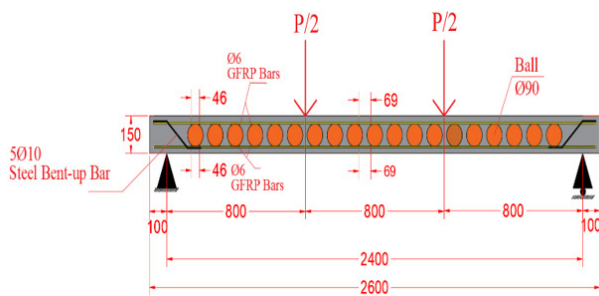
Longitudinal cross-section in bubbled slab including steel Bent-up bar.
